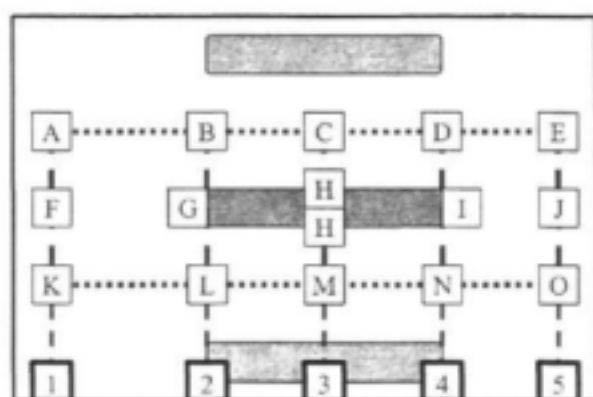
Describing and defining the plan view of a typical pier lay-out
